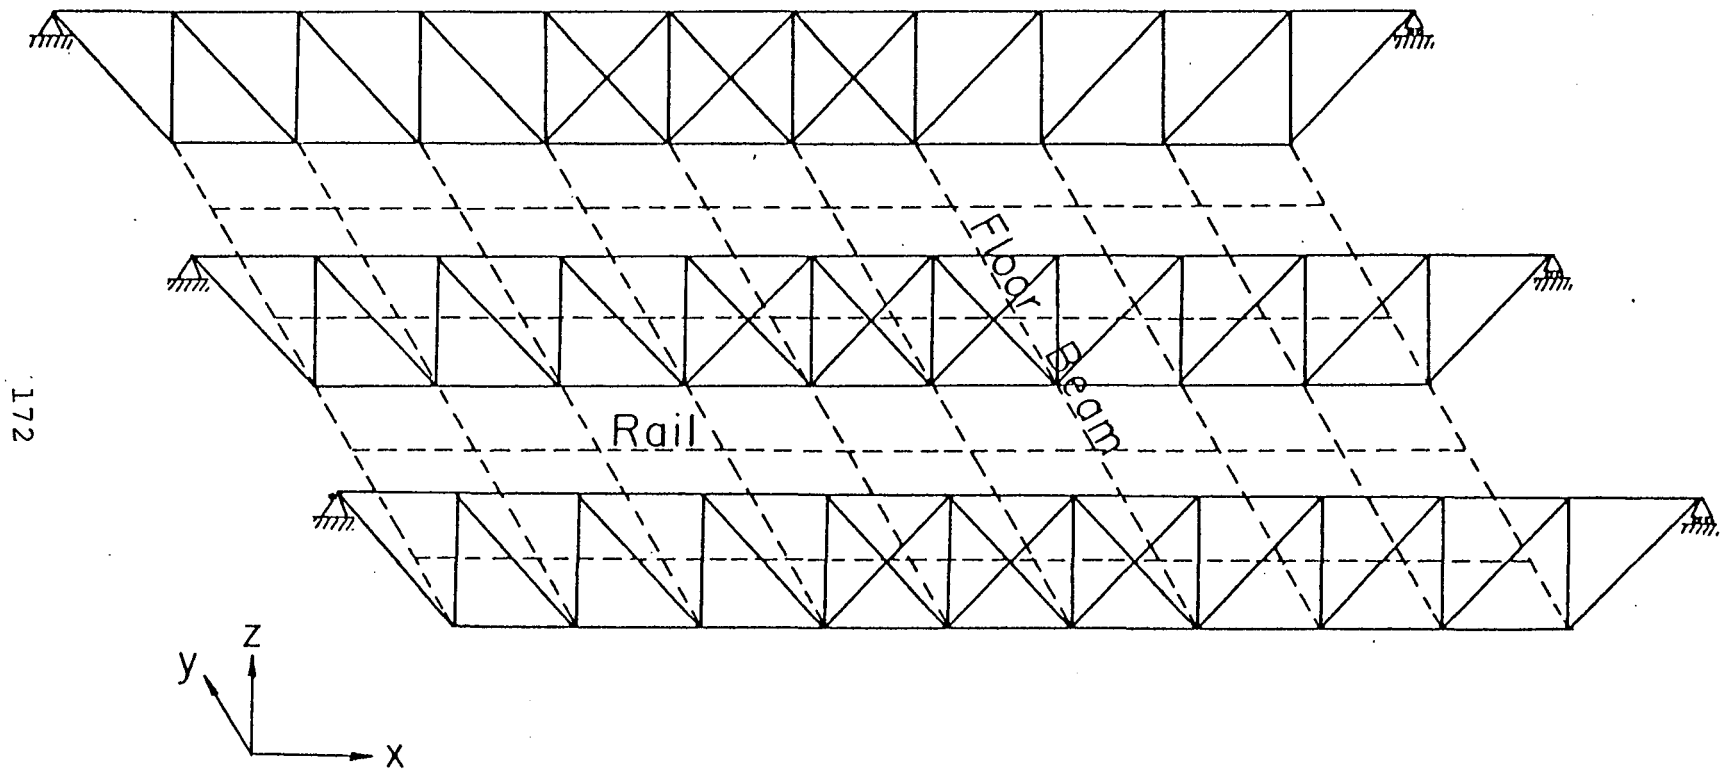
Three-Dimensional Space Frame Model of Frankford Elevated Line Viaduct Trusses
